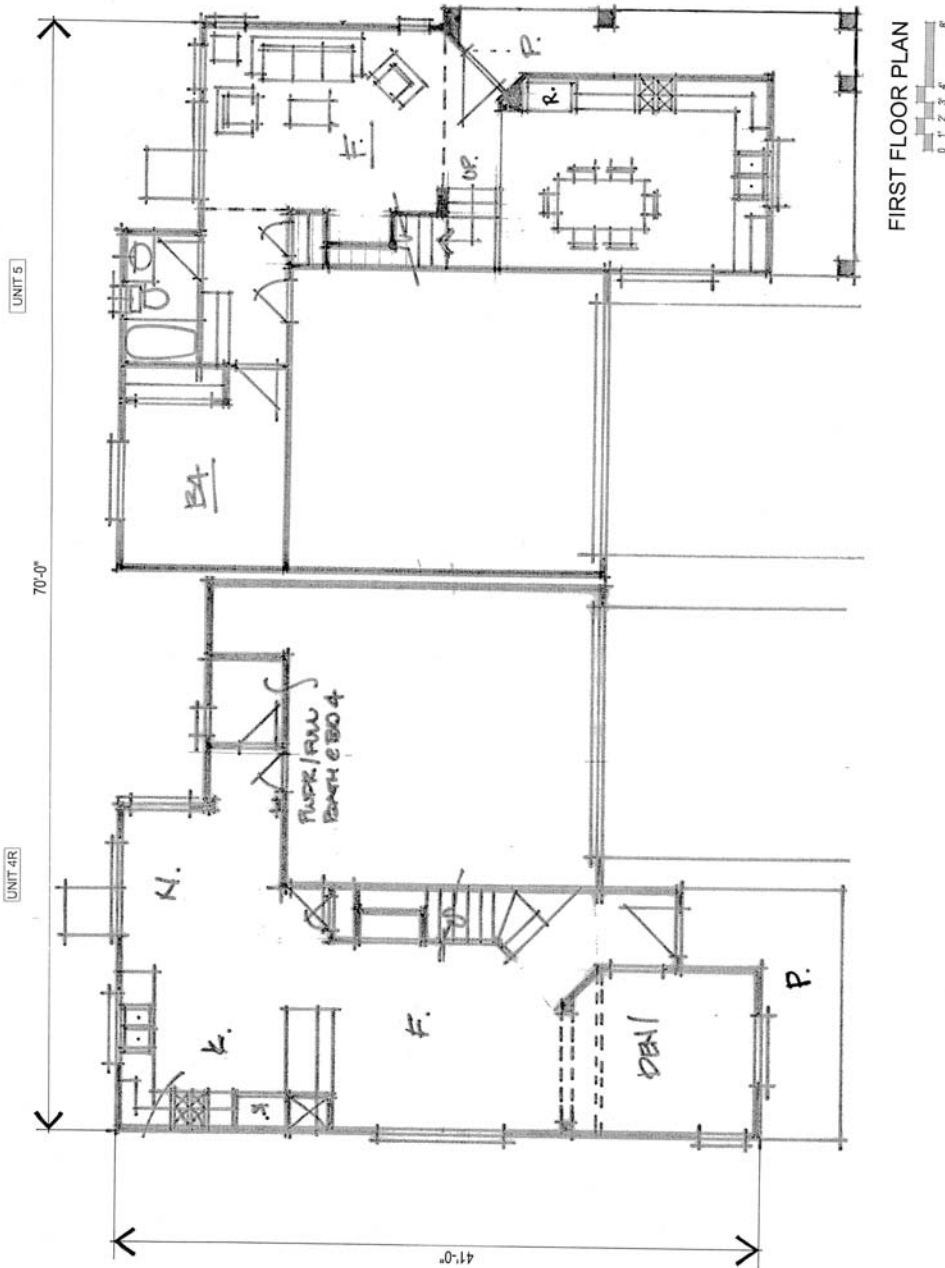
BUILDING F FLOOR PLAN (1 OF 2)
